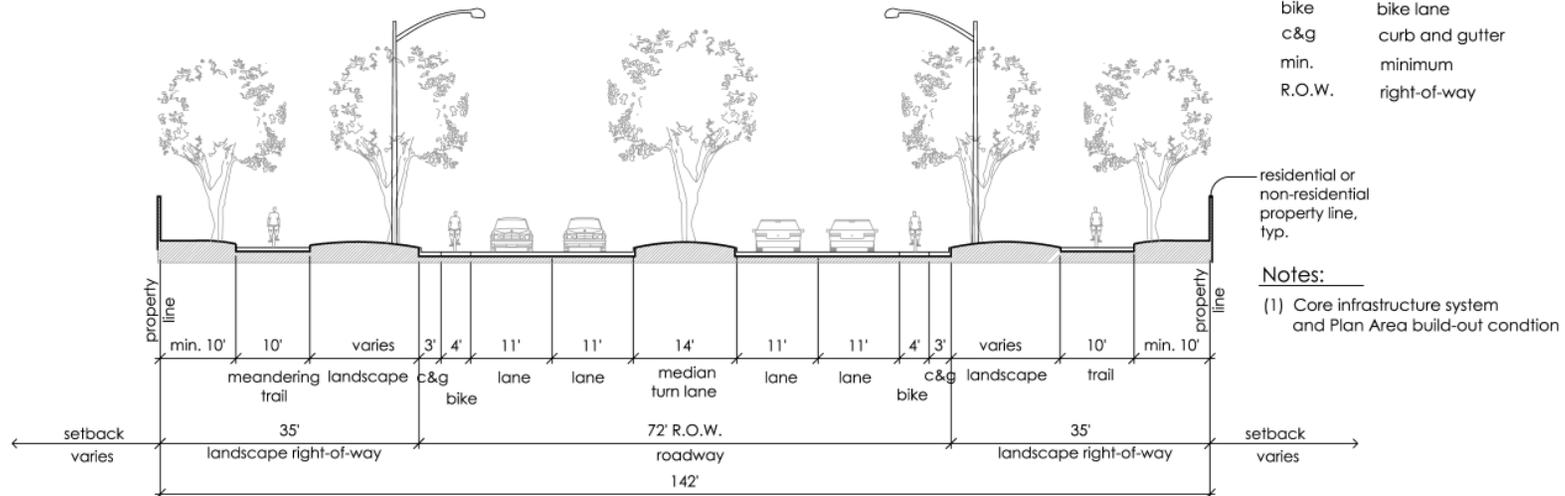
Roadway Sections–Major Arterial Street (Dyer Lane)
